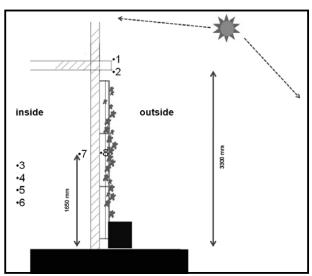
Section part for measuring point of biofacade wall. The external wall was facing west orientation.
